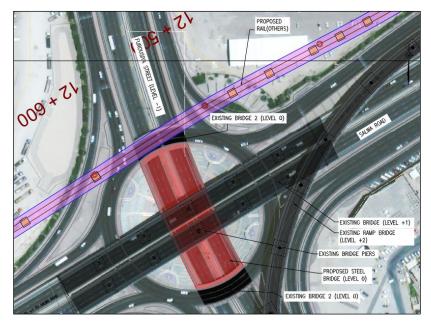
Layout of Junction 101 with the existing and proposed bridges
